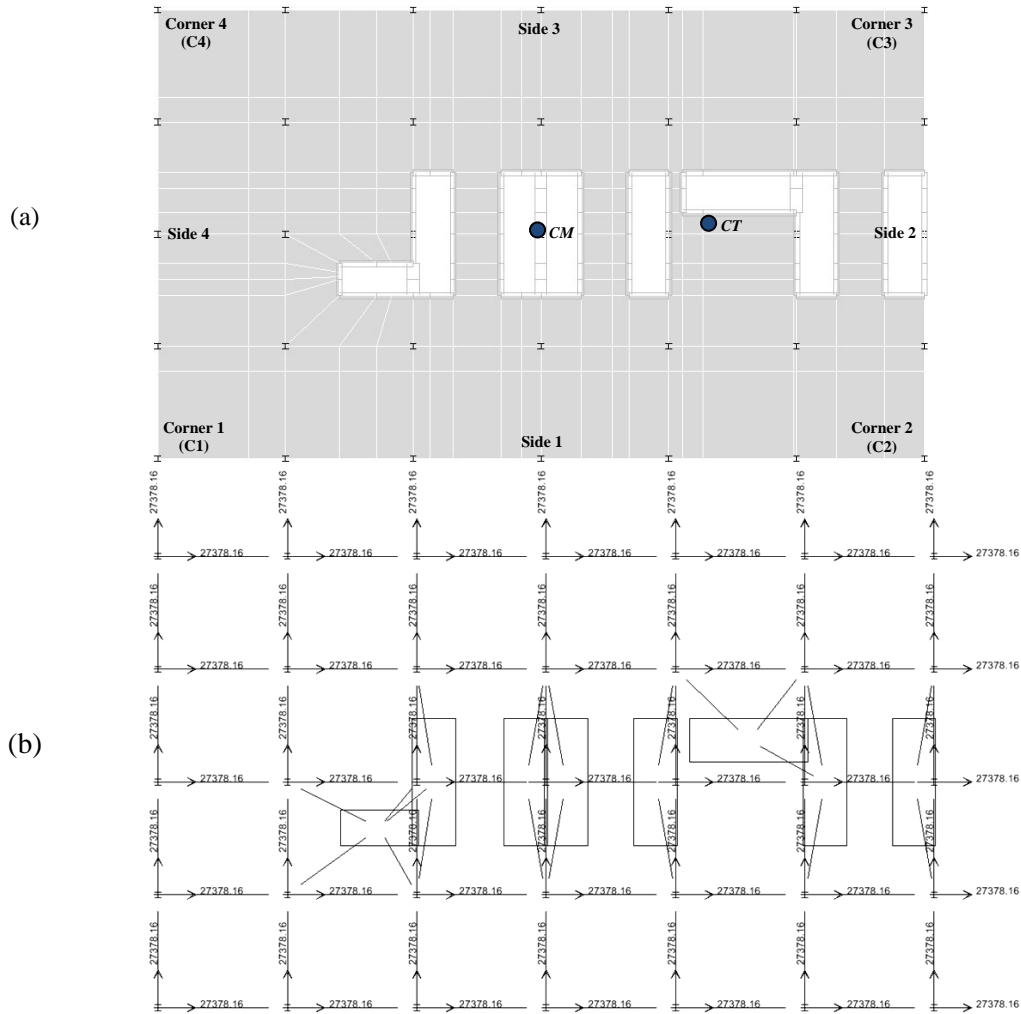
Floor Plan of the Indianapolis Building Showing the Statical System Consists of (a) Real Slabs and Shear Walls; and (b) Frame Elements and Slab Beams Installed with Lumped Masses (kg)
